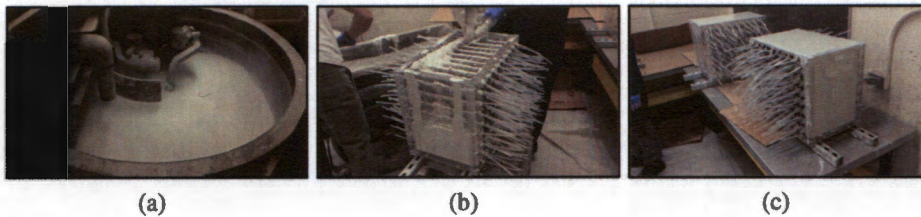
Mixing the contents of ULCC and casting concrete in formwork.
